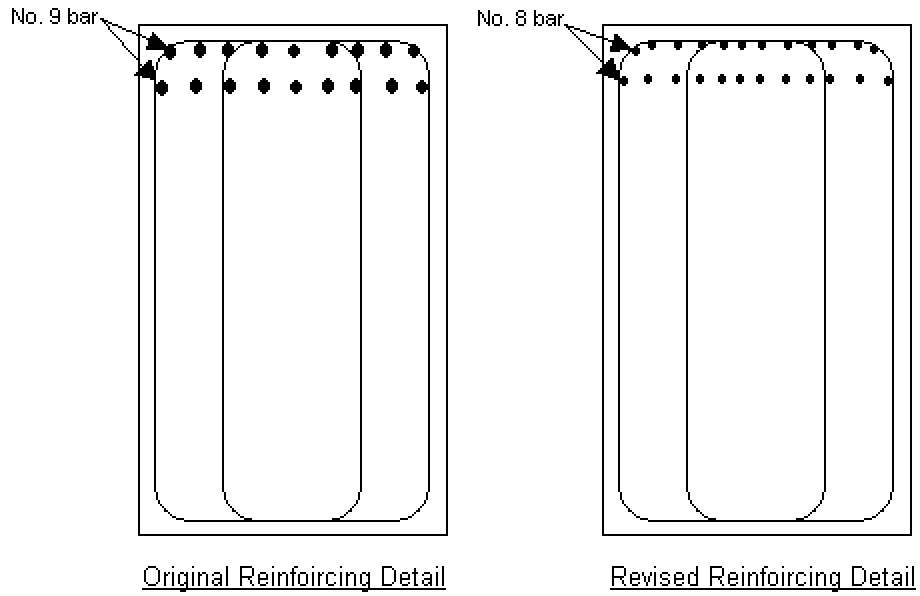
Reinforcing details of original cross-section and cross section modified to meet bar distribution serviceability requirements.
